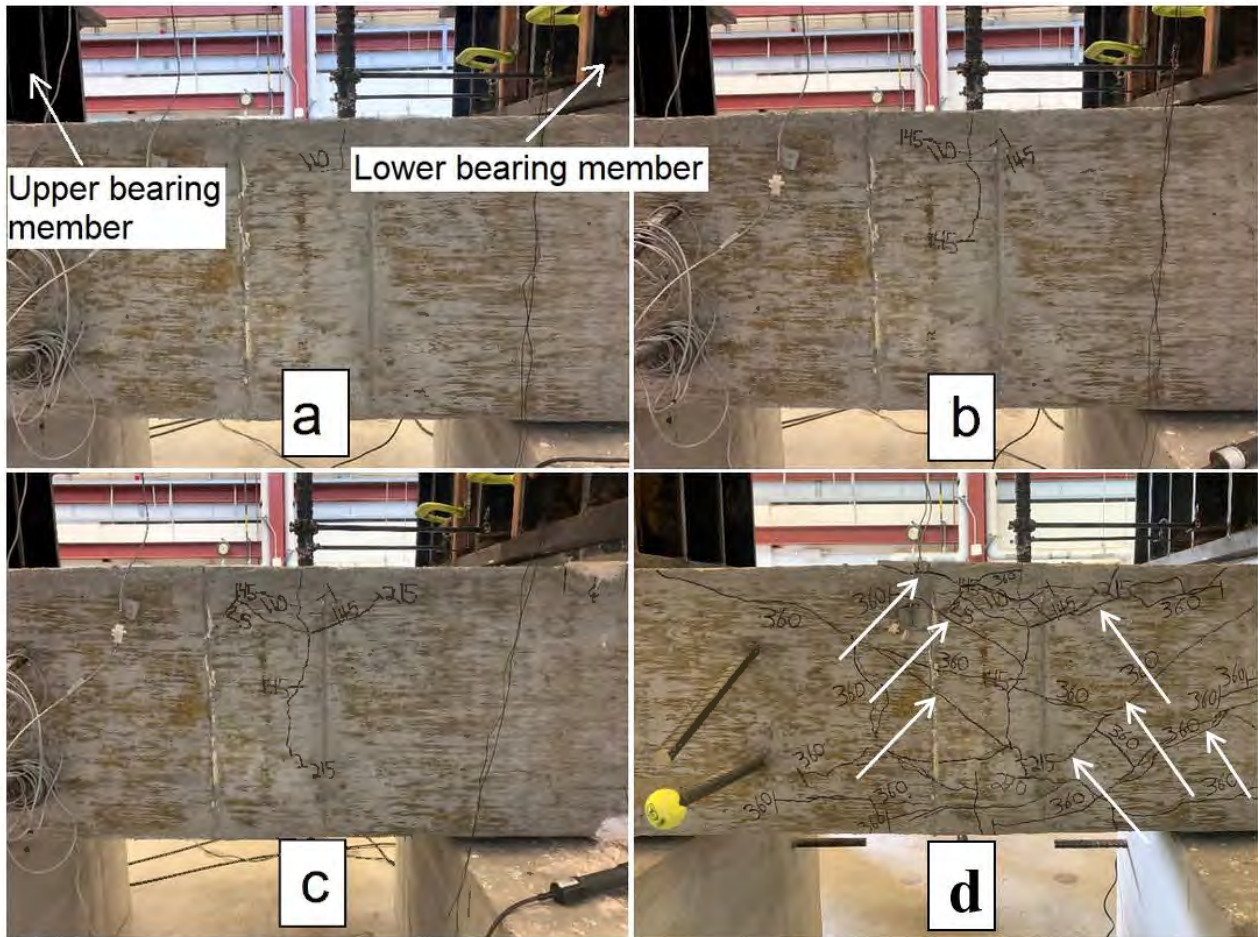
Example of cracking pattern in hooked bar specimens (side face, specimen H14-15): (a) Vertical crack likely initiating due to bar slip, (b) and (c) Cracks propagating and branching towards upper and lower bearing members, (d) Cone-shaped cracking pattern near failure (see arrows.)
